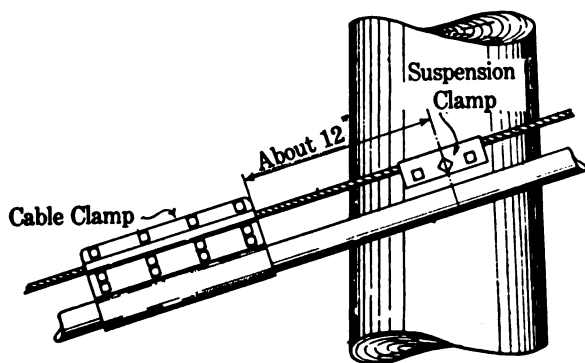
CLAMPING CABLE TO MESSENGER ON STEEP GRADES
